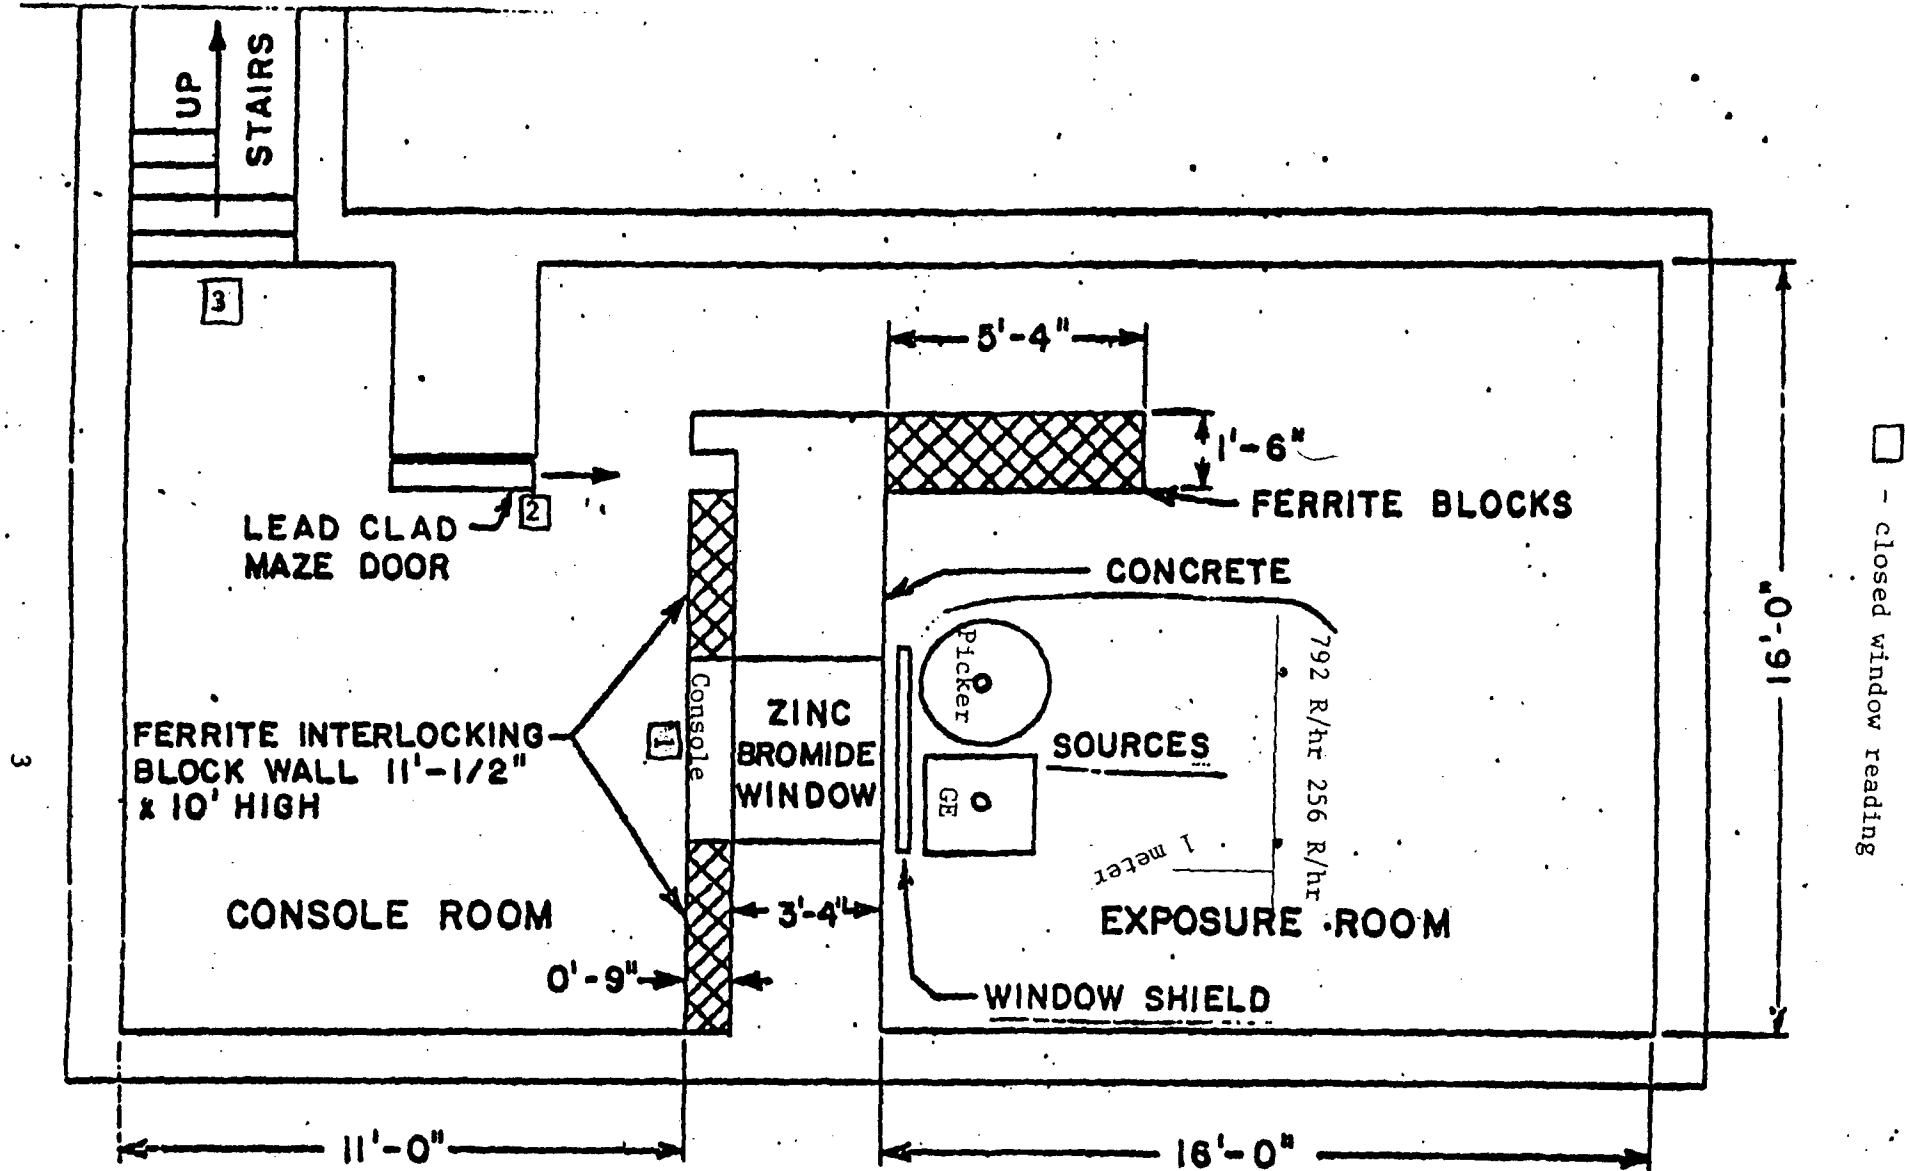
PLAN VIEW UNDERGROUND VAULT
